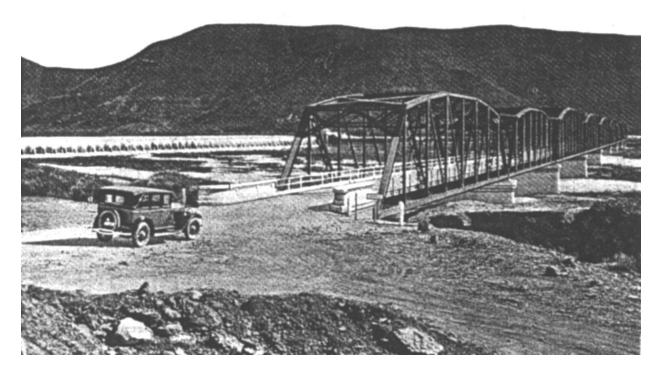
Gila River Bridge on U.S. Highway 80, circa 1927
